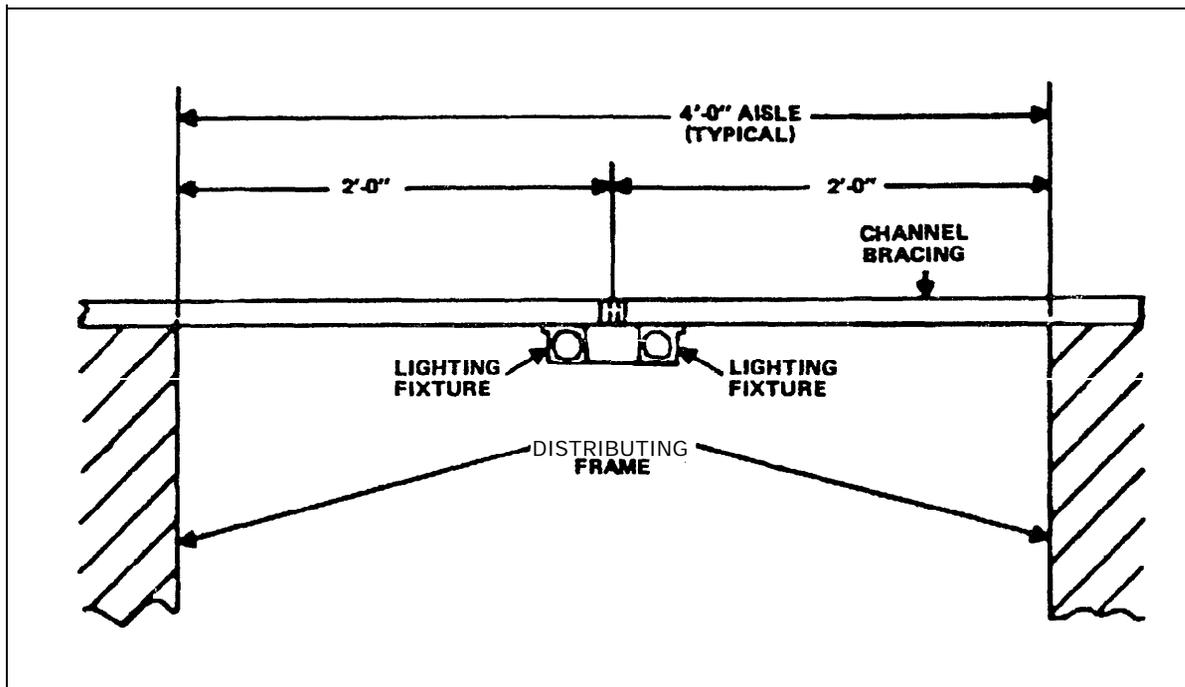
Typical Placement of Lighting Between Distributing Frames
